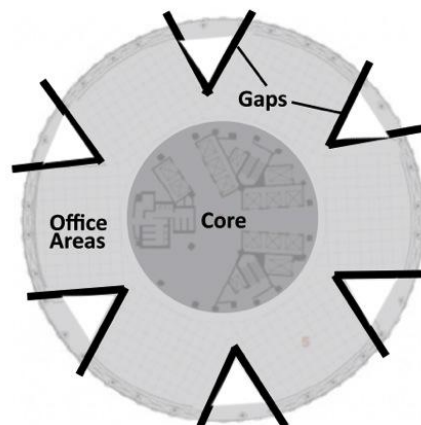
Office floor plan and 6 Gaps between the floors (Adapted and Re-drawn: www.fosterandpartners.com)
